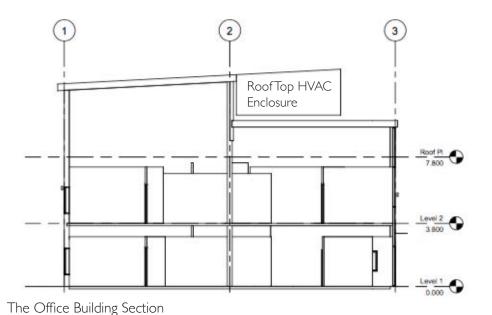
Figure C-The Office Building Elevations (Office Building Elevations and Perspective View Drawing, J Gorka Architect, 2018) Scales are not applicable to this report
